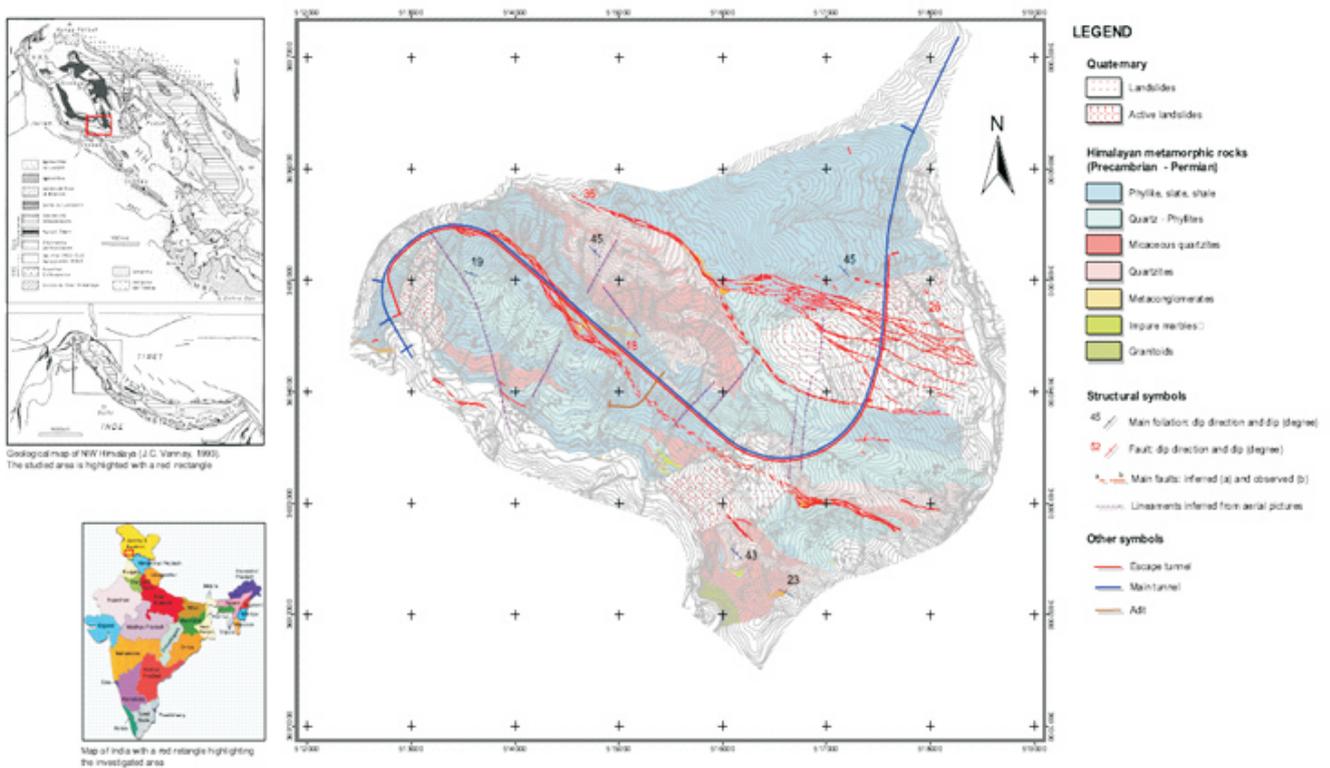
General layout plan of tunnel T74-R re-modified after IRCON Project NO:IRCON/1014/J and K. KQ/Consultancy T74R/178
